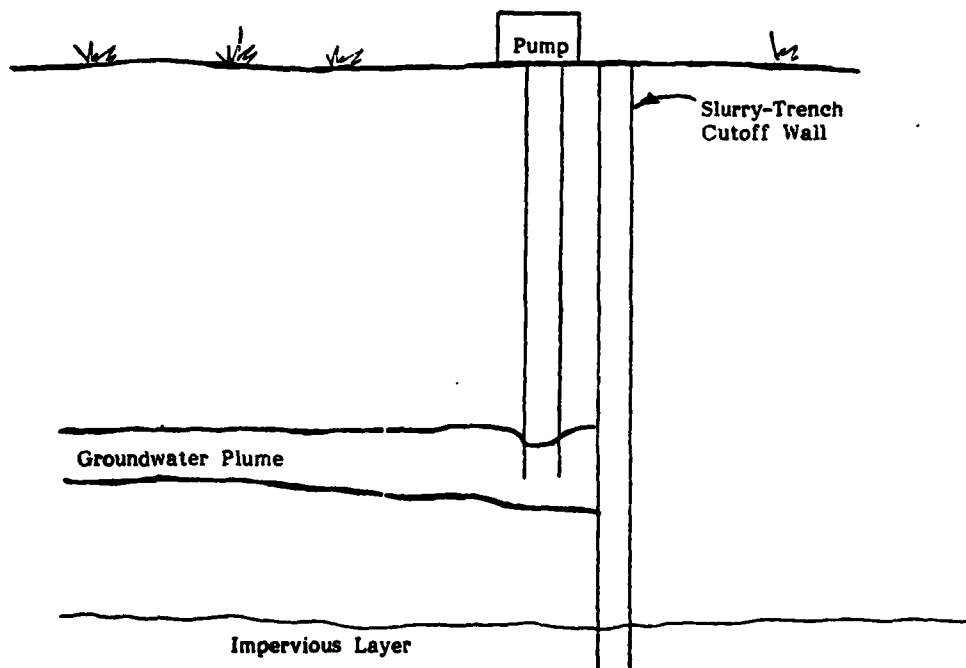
Cross Section of Slurry-Trench Cutoff Wall for Containment of a Contaminated Ground Water Plume
